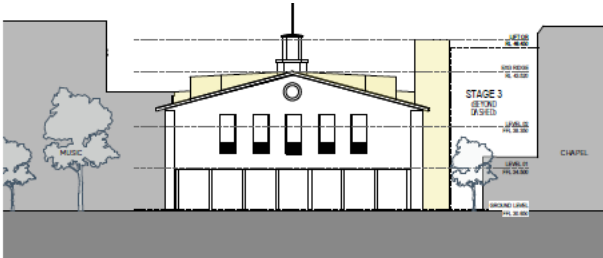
Proposed south elevation (massing only) of Centenary Hall).
